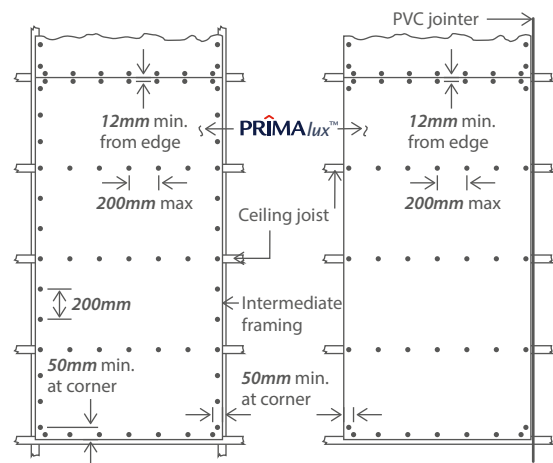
PRIMA^{lux}™ Ceiling Laid Across Joists
